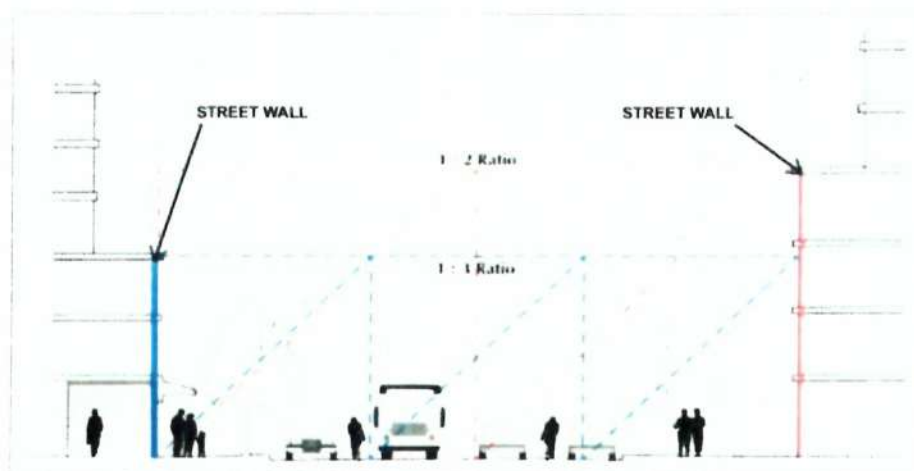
A building height-to-street-width ratio of between approximately 1:3 and 1:2 is recommended to frame streets and provide human scale. Portions of buildings above the street wall are encouraged to step back.
